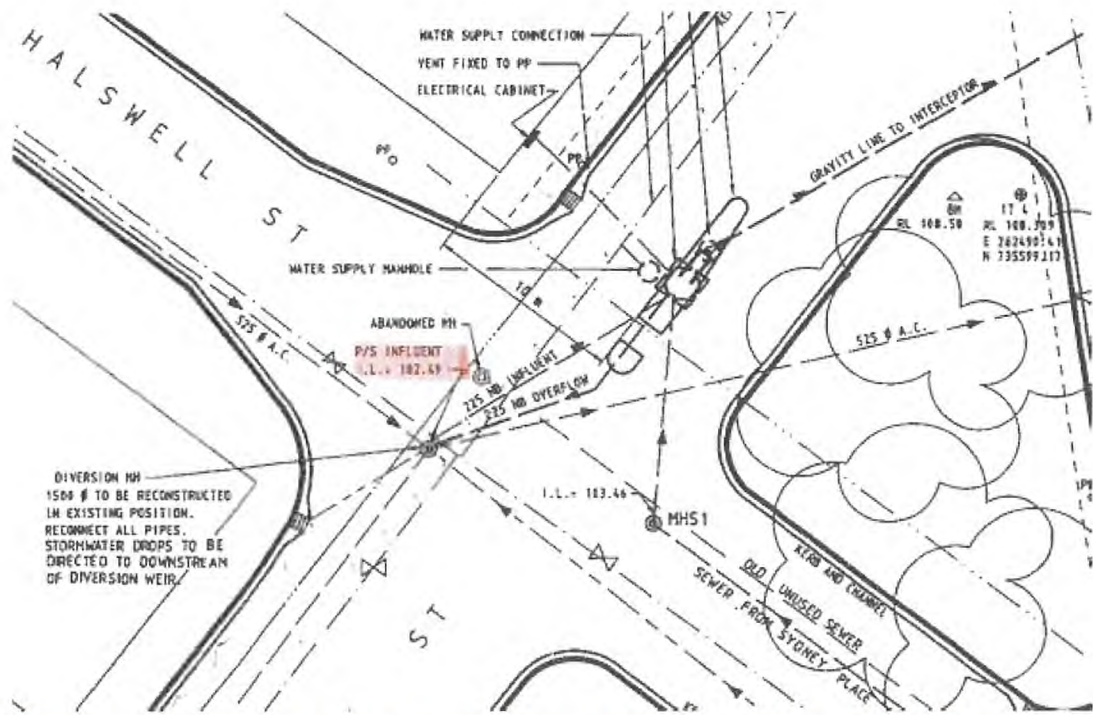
Liverpool Pump Station Cross Connection and Overflow Plan
